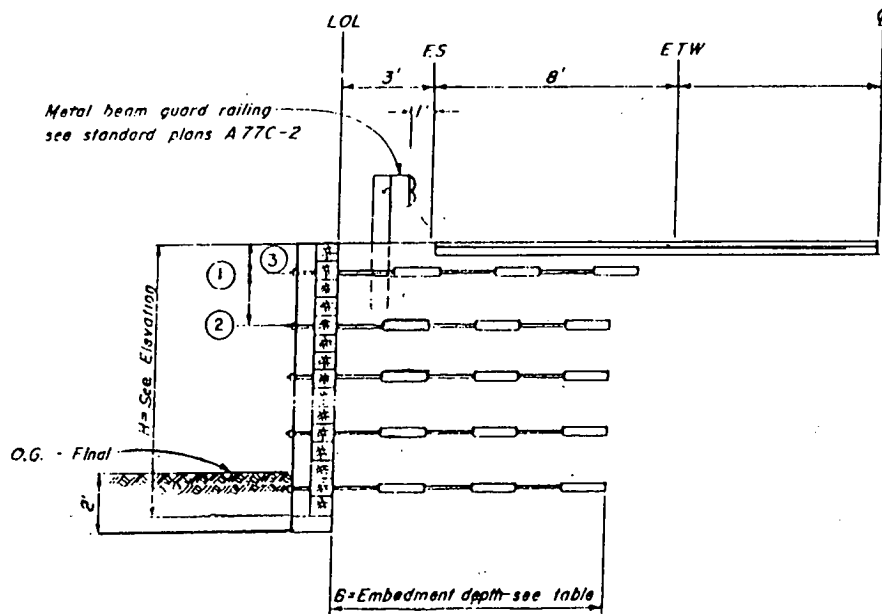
Typical cross section of tire and tie bar anchor (99).
